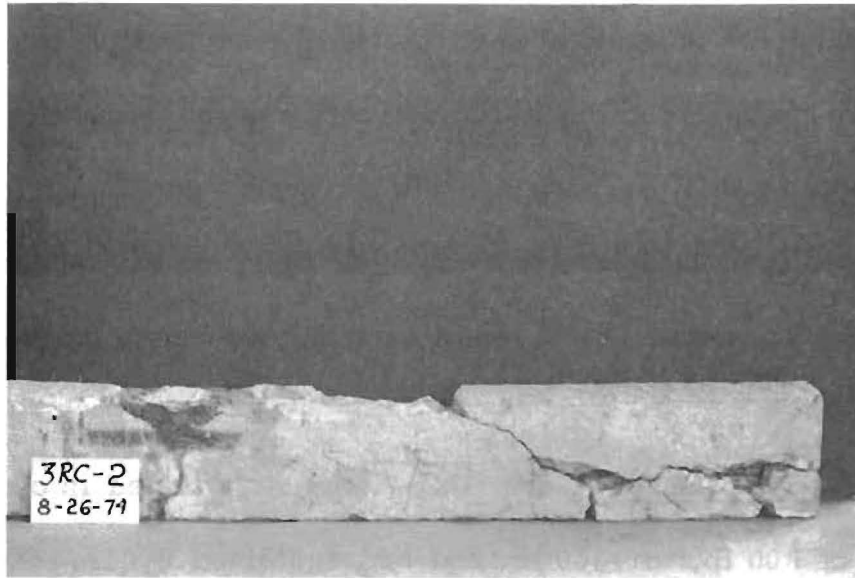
FAILURE MODE OF BEAM 3RC-2
